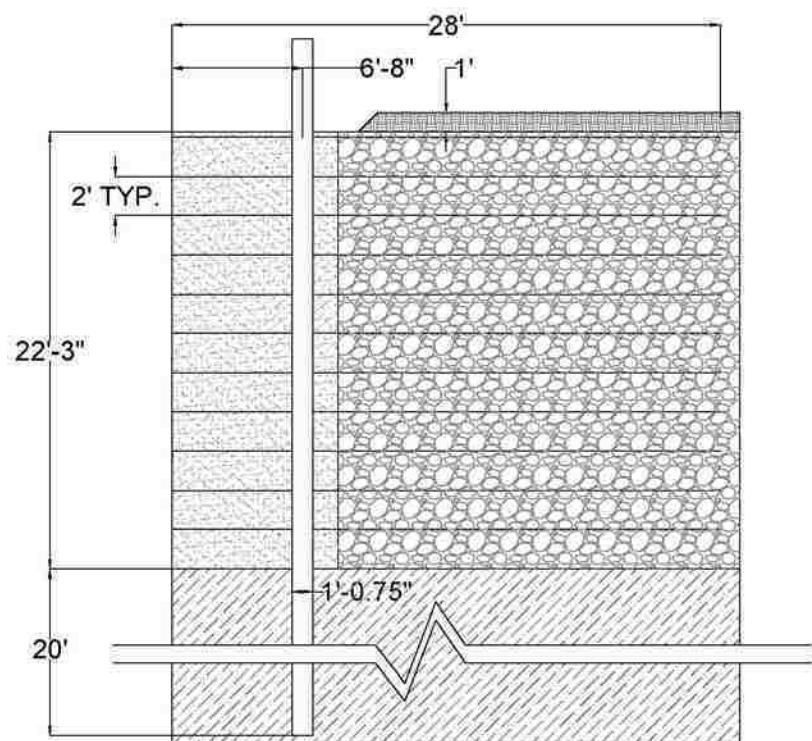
Profile view of Test Pile 3 (TP3); cross-section C-C from Figure 3.3
